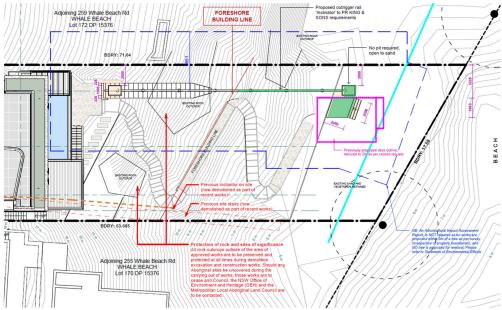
Extract of Site Plan with works the subject of this clause 4.6 request highlighted in green.
